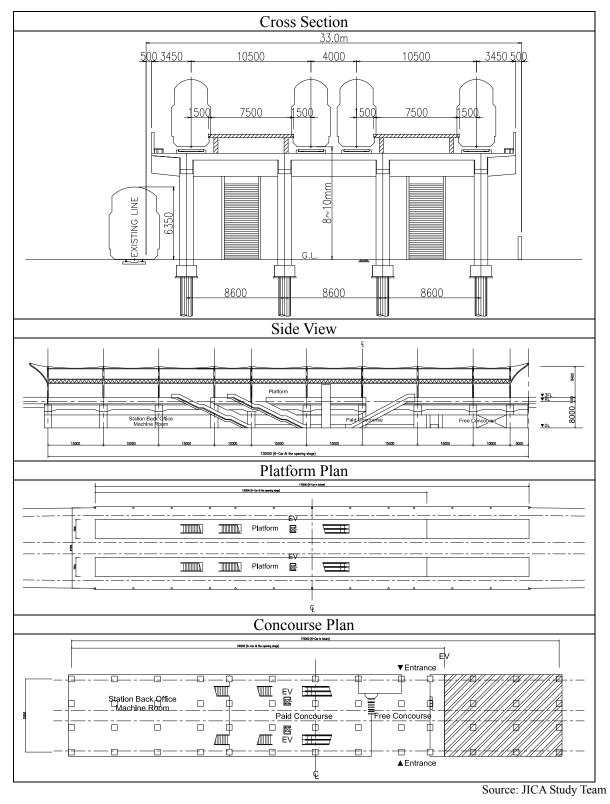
Station Plan (Elevated 2-Island, Ground Concourse)
